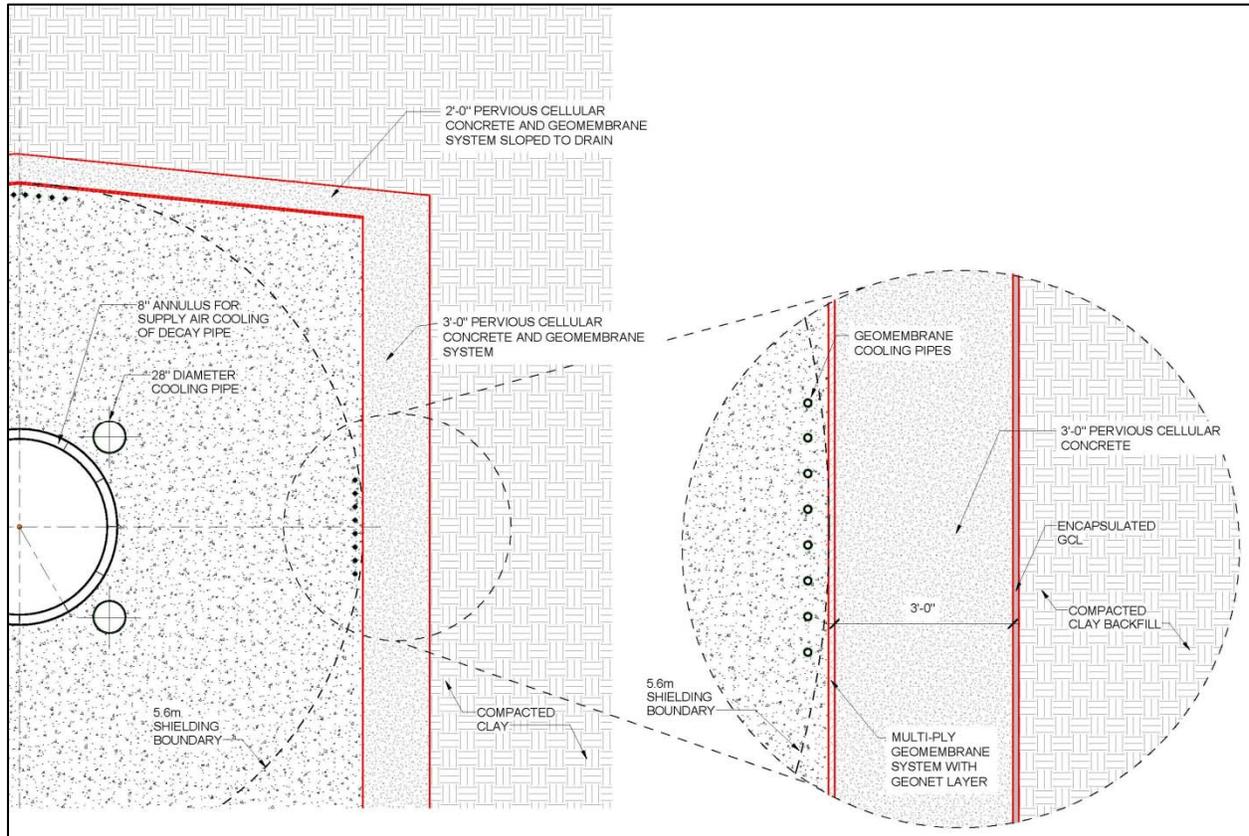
Geomembrane System Section View (From Outside Right to Inside Left in the Exploded View)
